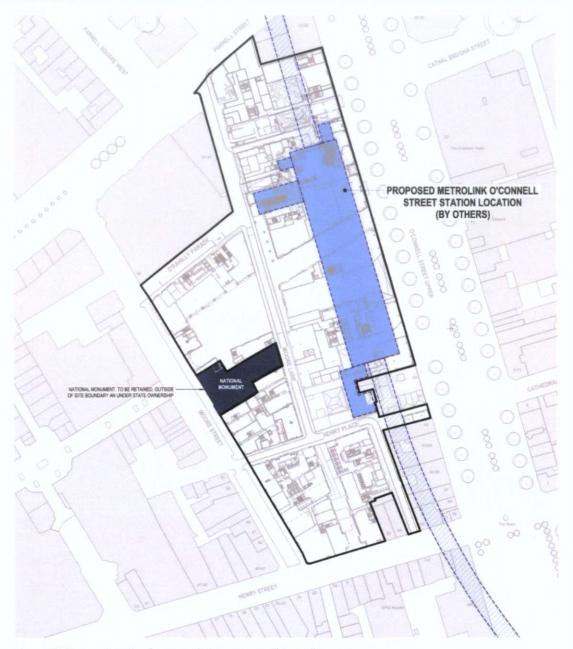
Location Plan for Metrolink Station at O'Connell Street Upper.
